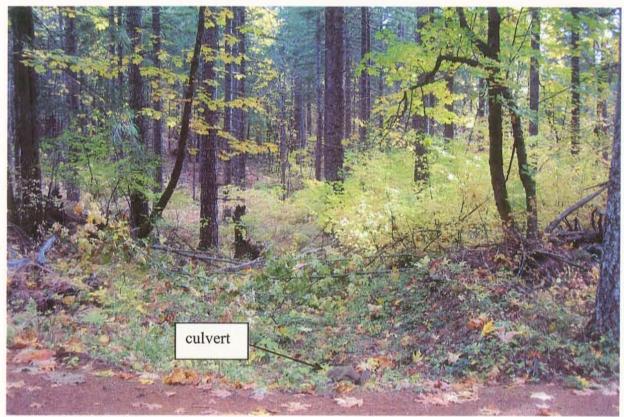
Looking southeast downslope from road. Note rock over culvert. 10/26/06.
